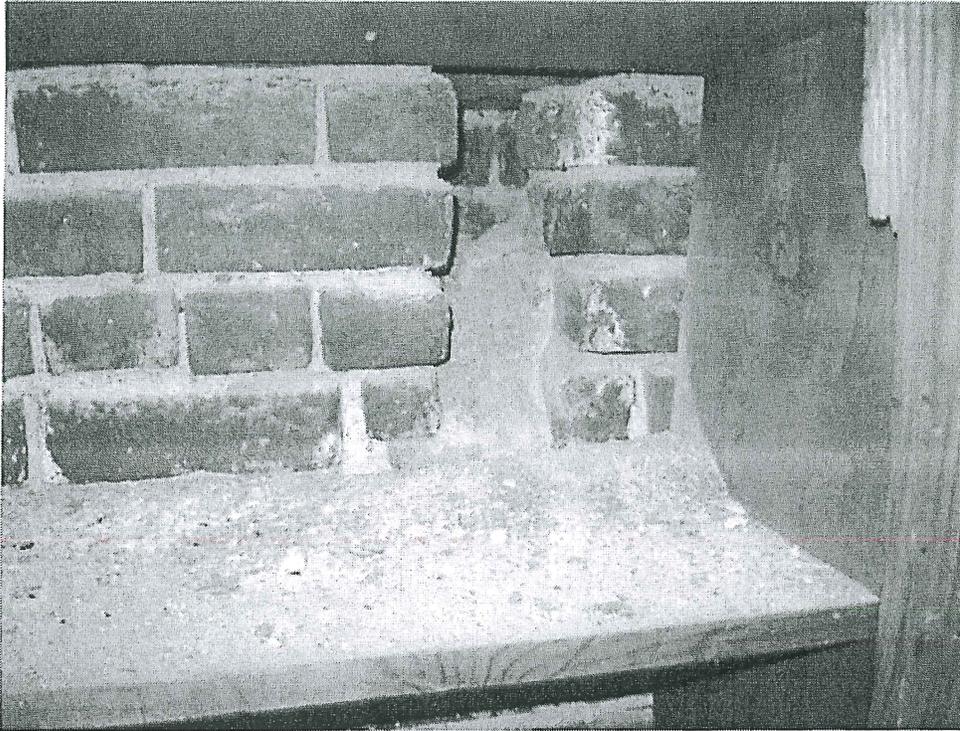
View of mortar loss above the fourth floor (interior)
